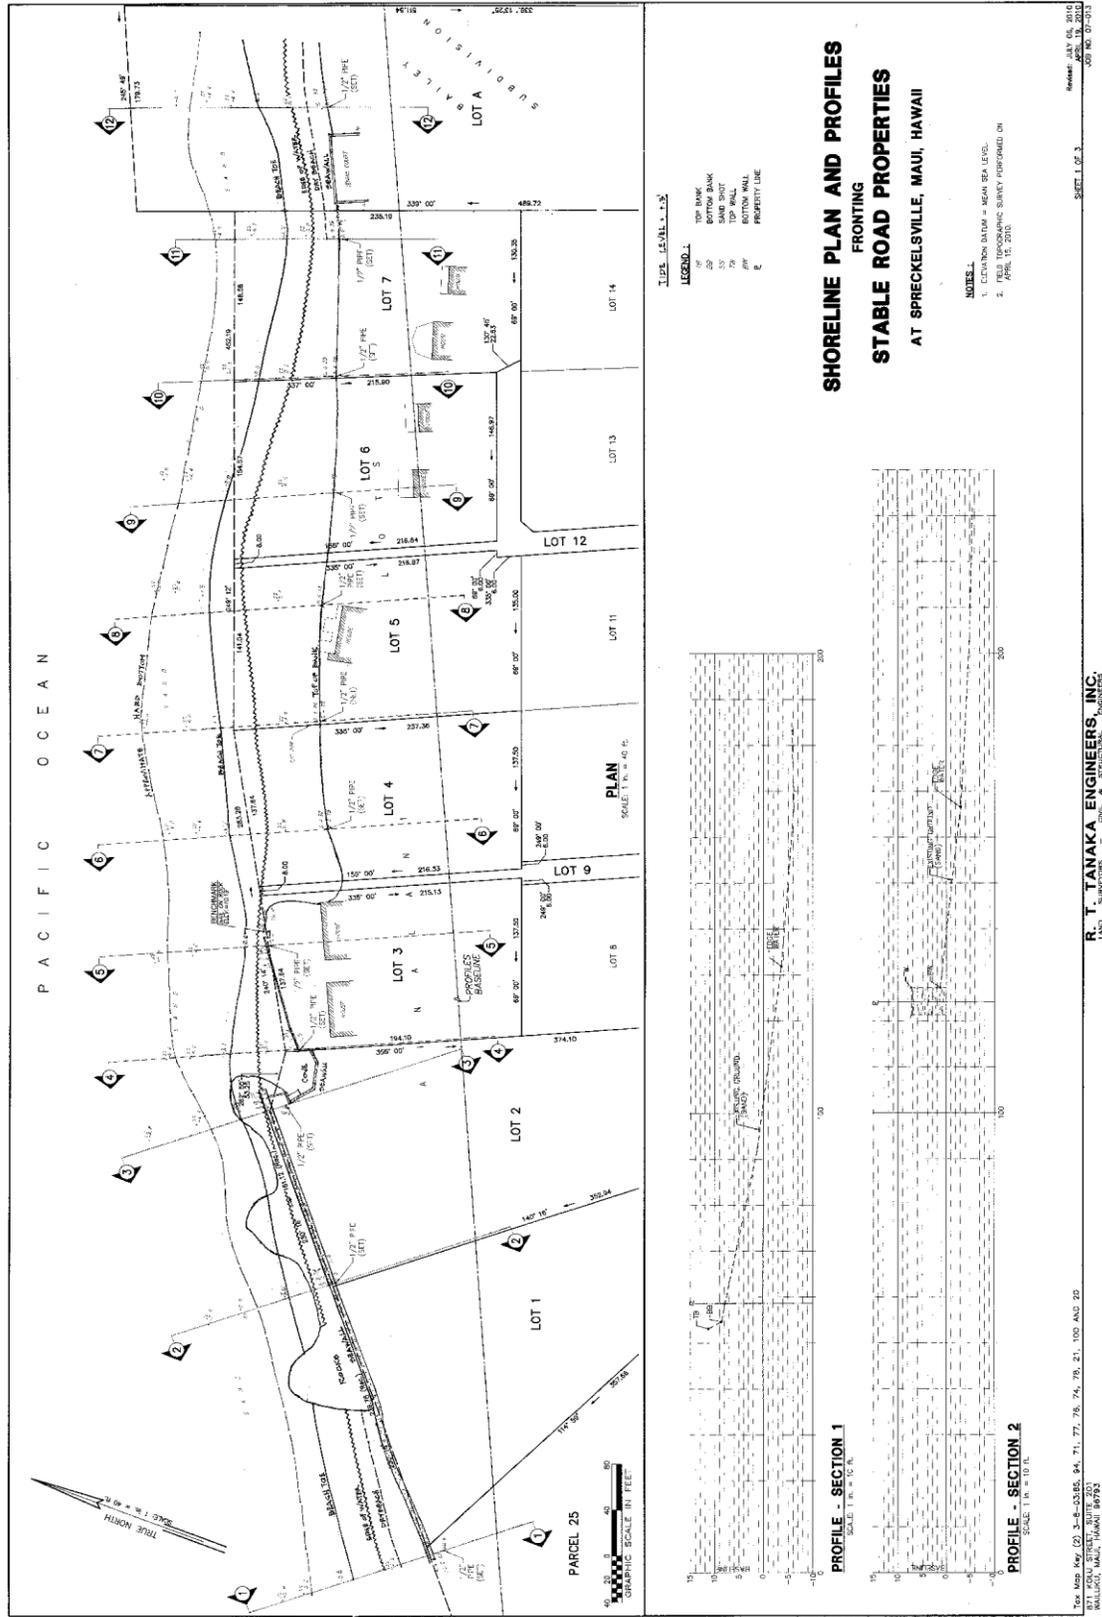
Pre-Construction Site Plan and Beach Survey Profiles, 15 April 2010
